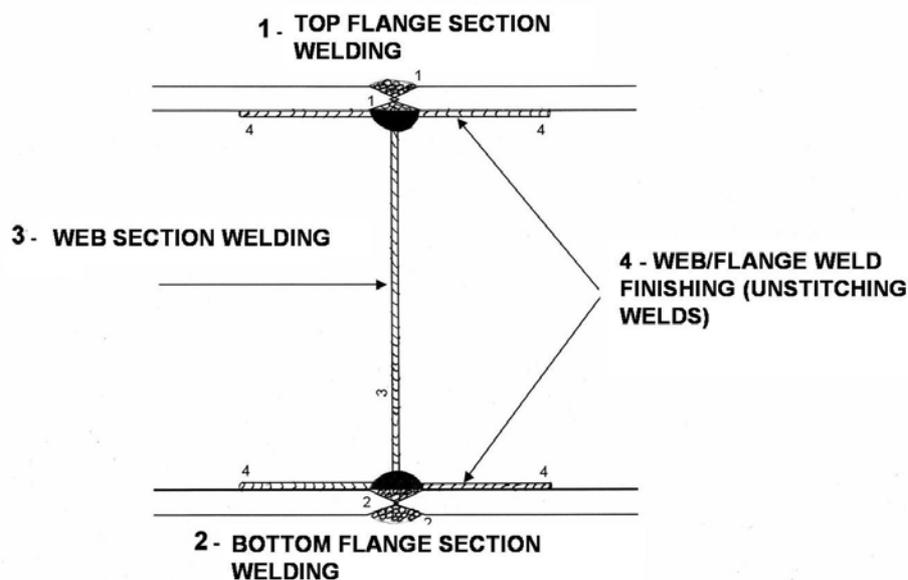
Sequencing of main girder butt welds on a twin girder steel frame
